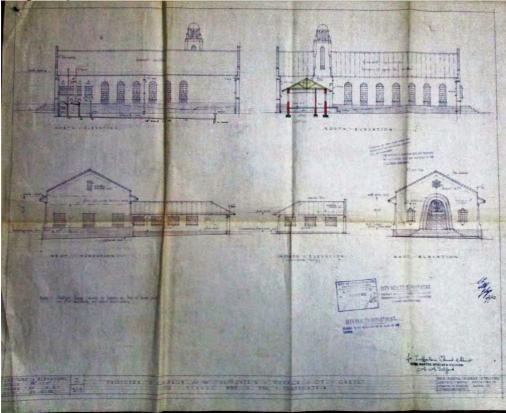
Original plan for Church of Christ in Turffontein (Source: City Council of Johannesburg, Plans Archive)
